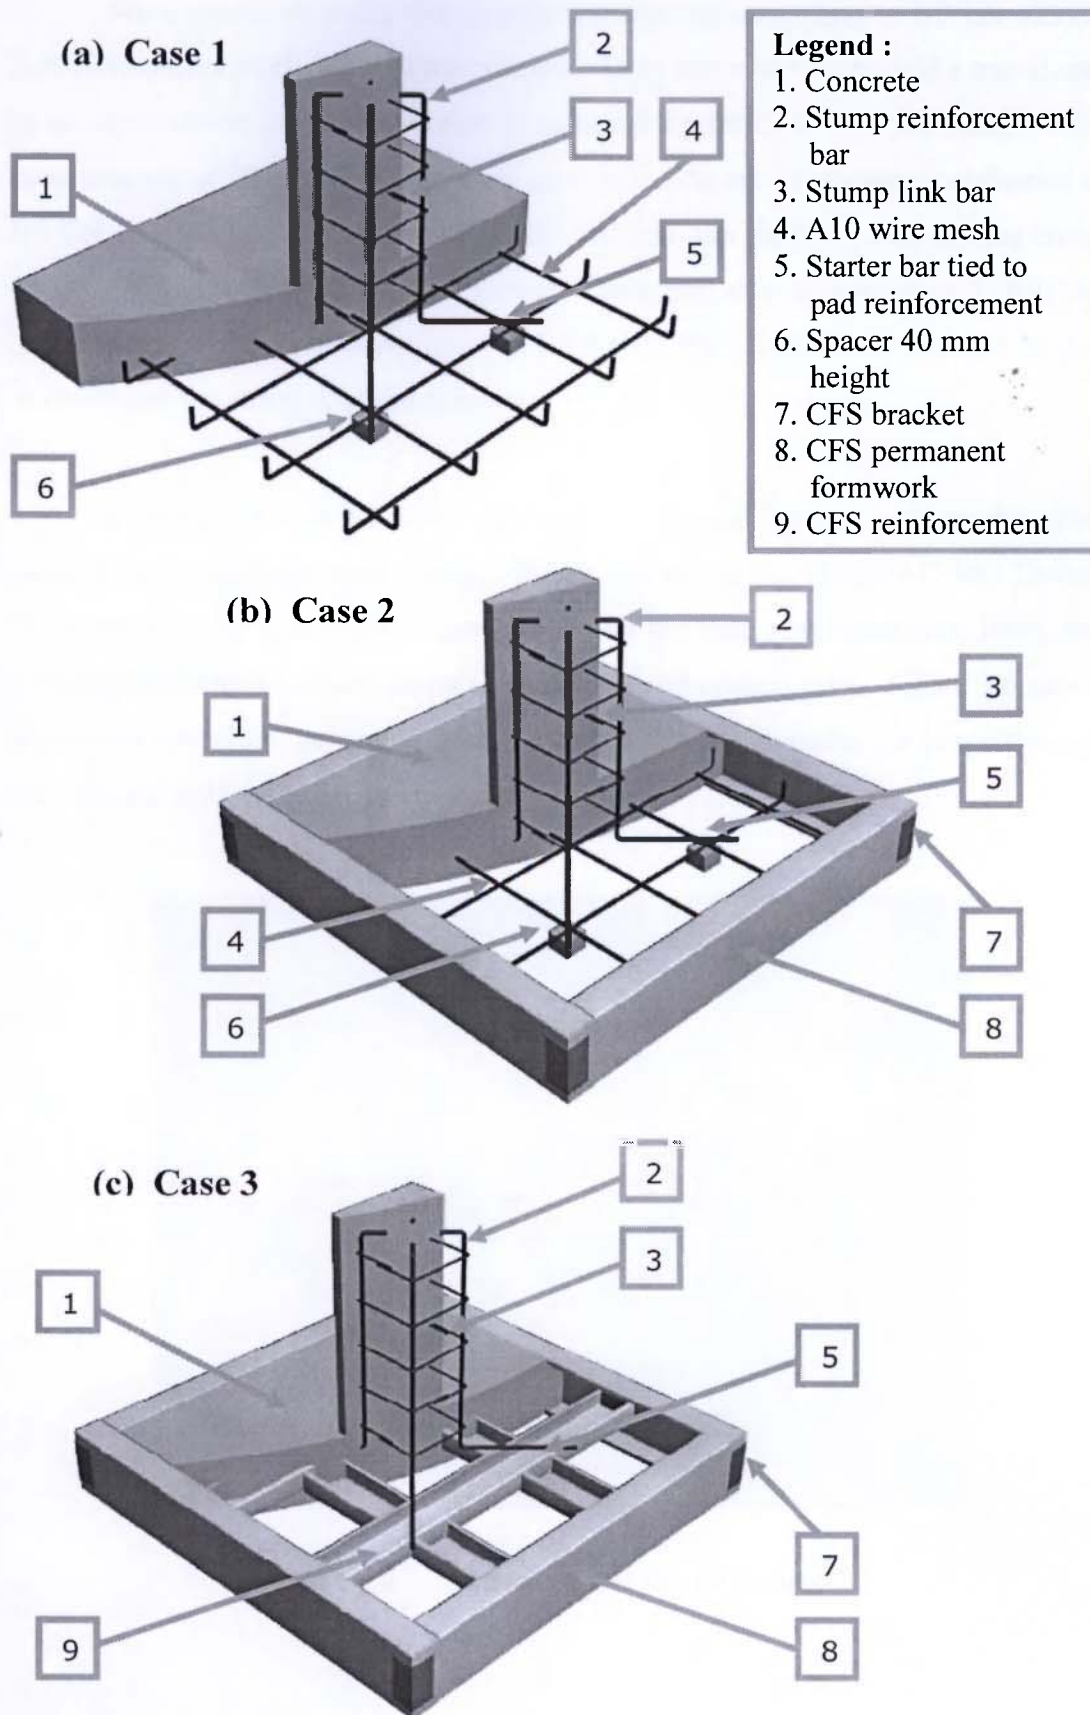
Illustration of (a) Case 1 specimen, (b) Case 2 specimen, (c) Case 3 specimen
